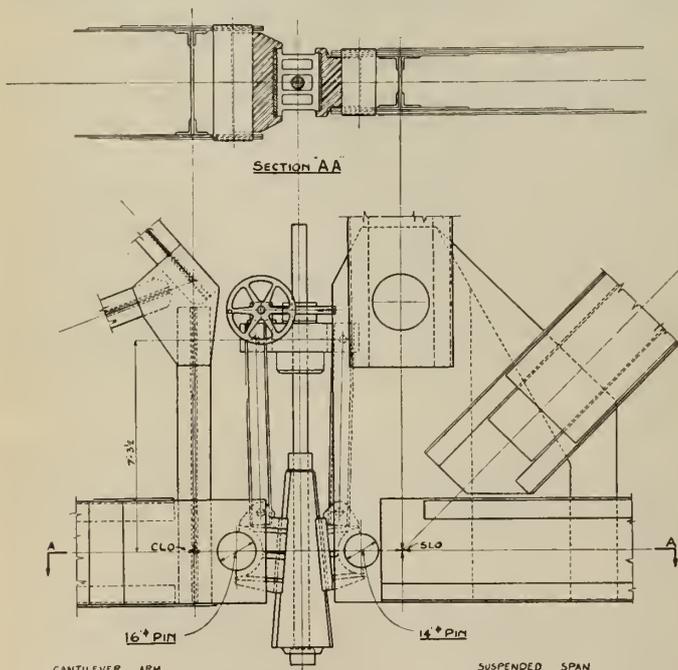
Main Span, Centre Section, Assembly of Wedge Mechanism in Bottom Chord at CLO.
